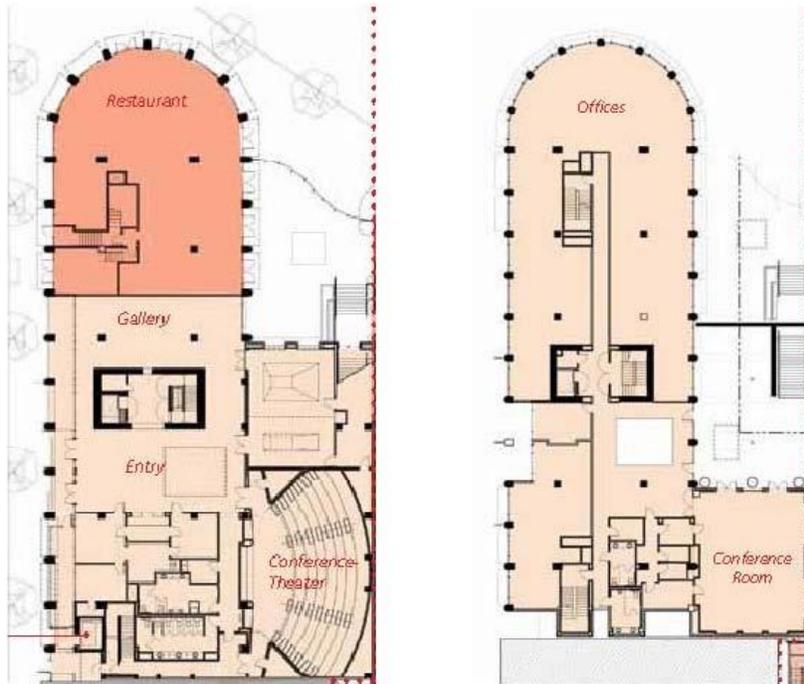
(Left) ground floor plan. (Right) Second floor plan
